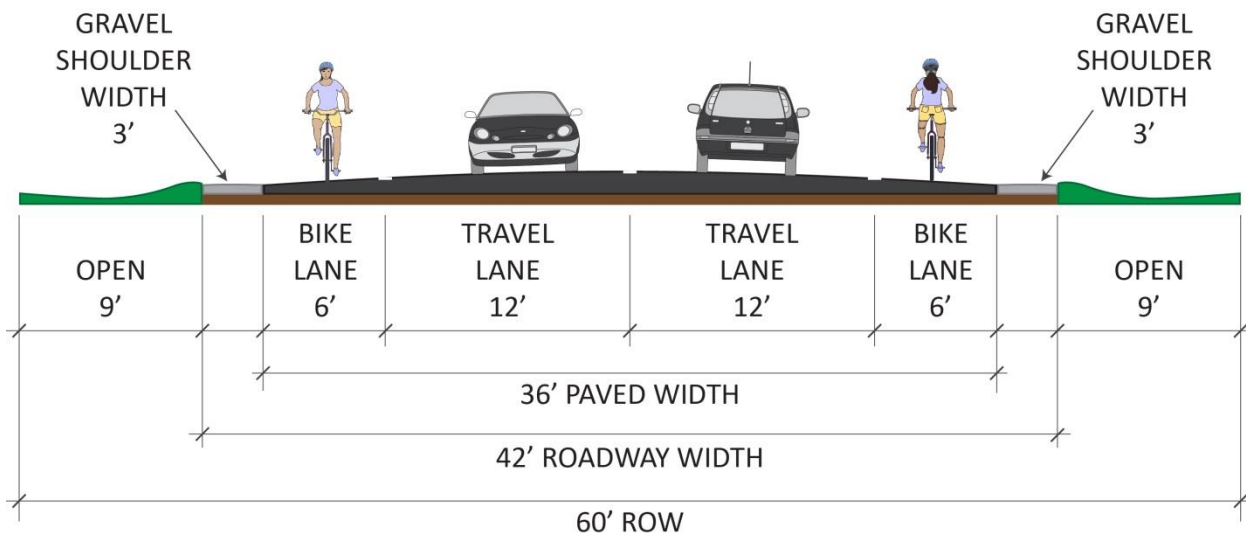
Paved County Roads with Bike Lanes (Collector or Local Roads)
